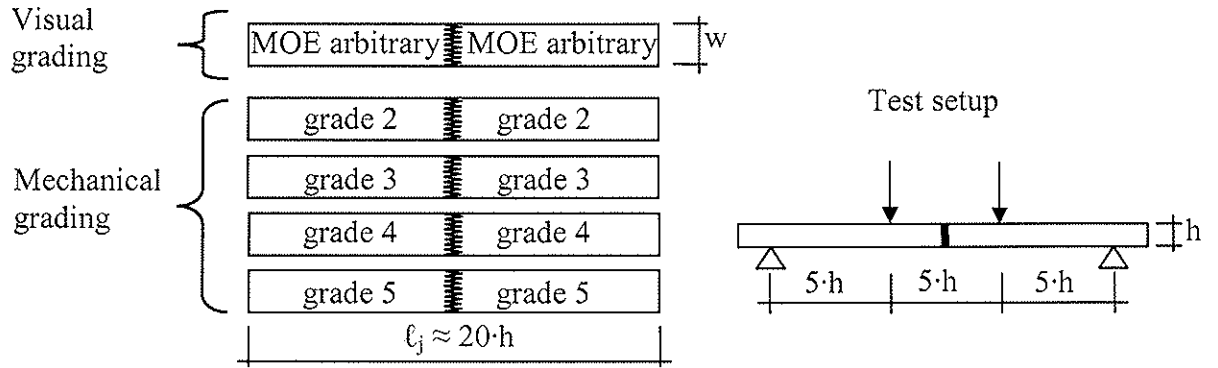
Finger joint specimen manufacture (left) and test setup (right)
